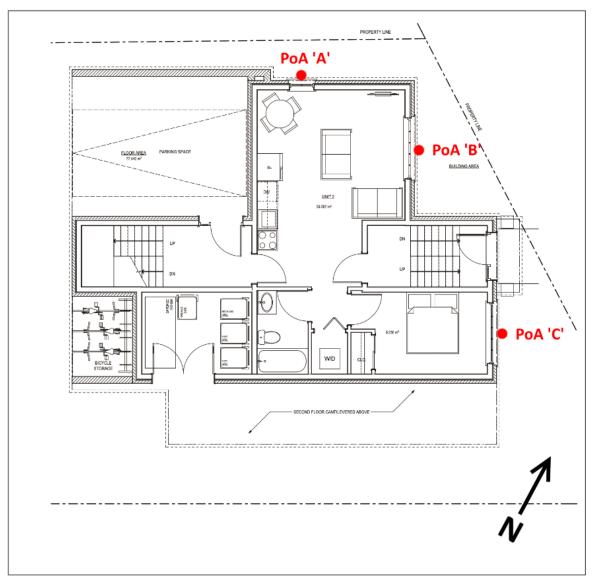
Site plan showing location of Points of Reception POA 'A', POA 'B' & POA 'C' on the Lower Level of Building 'A'.
